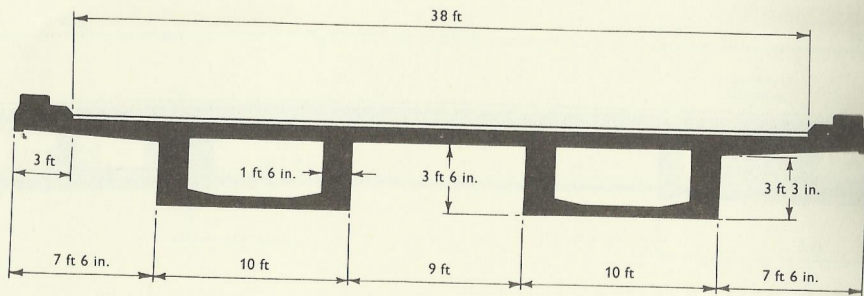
Typical cross-section, three-lane elevated road superstructure.
